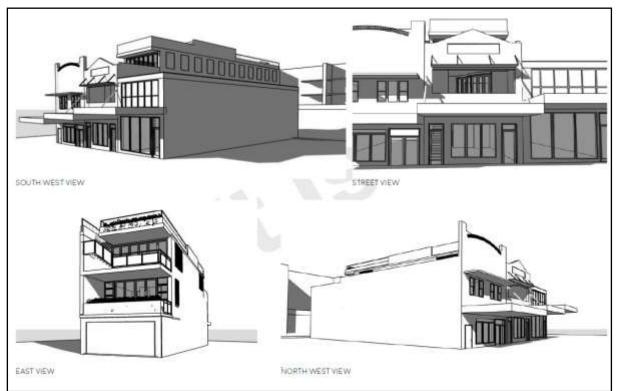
3D Elevations (NB: Superseded plan – rooftop front balustrade since removed, as clouded in Figures 5 – 7 above)
